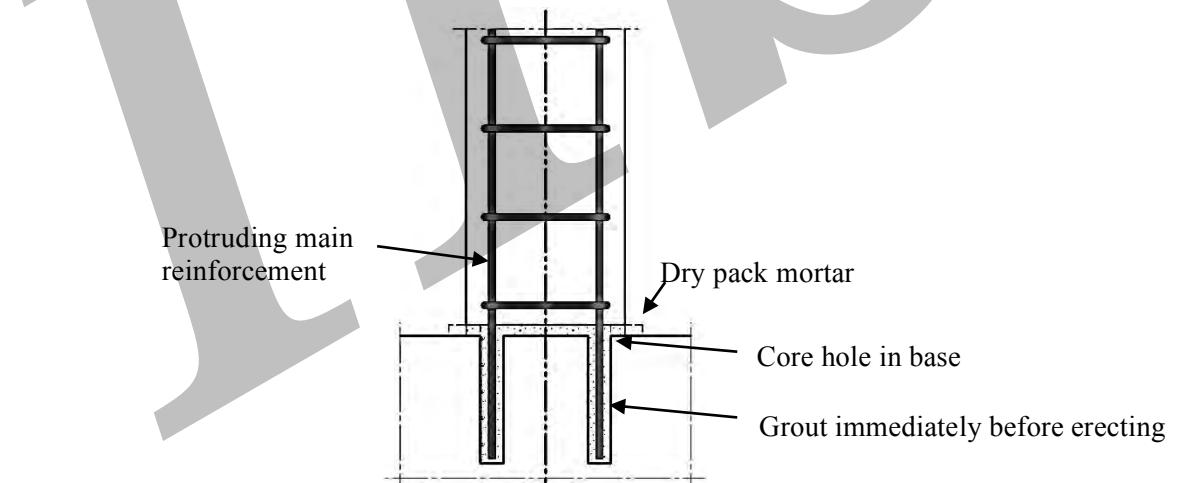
Column base connection with grouted holes in the foundation and projecting reinforcement from the column
